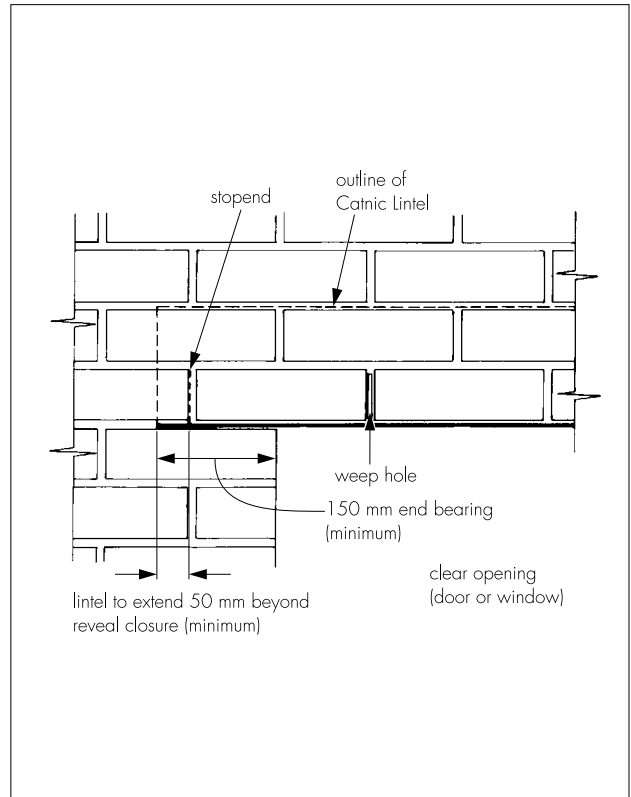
Detail showing minimum end bearing stop-ends and weep holes
